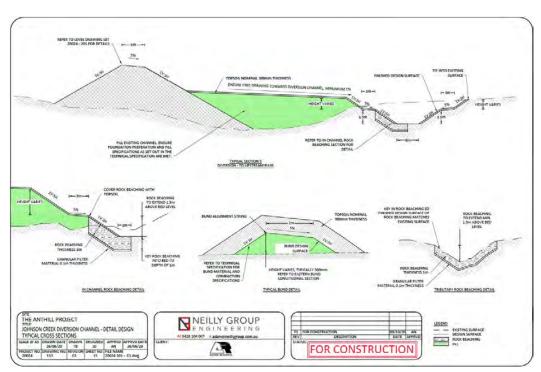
Neilly Group Engineering (2020) typical design sections for upstream plug, in channel rock beaching detail, bund detail, tributary rock beaching detail
